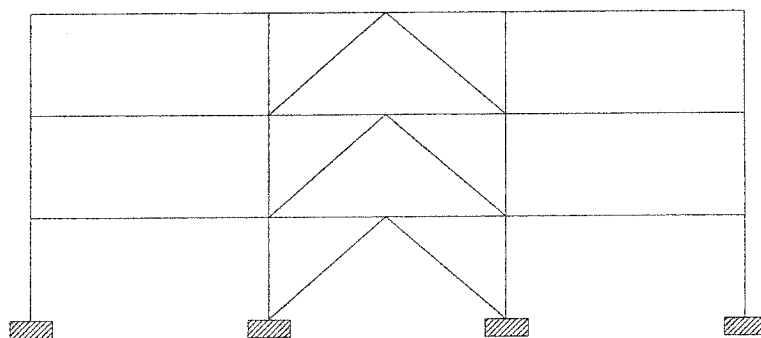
Elevation of Conventionally Strengthened 3-Story Building Using A Brace System
